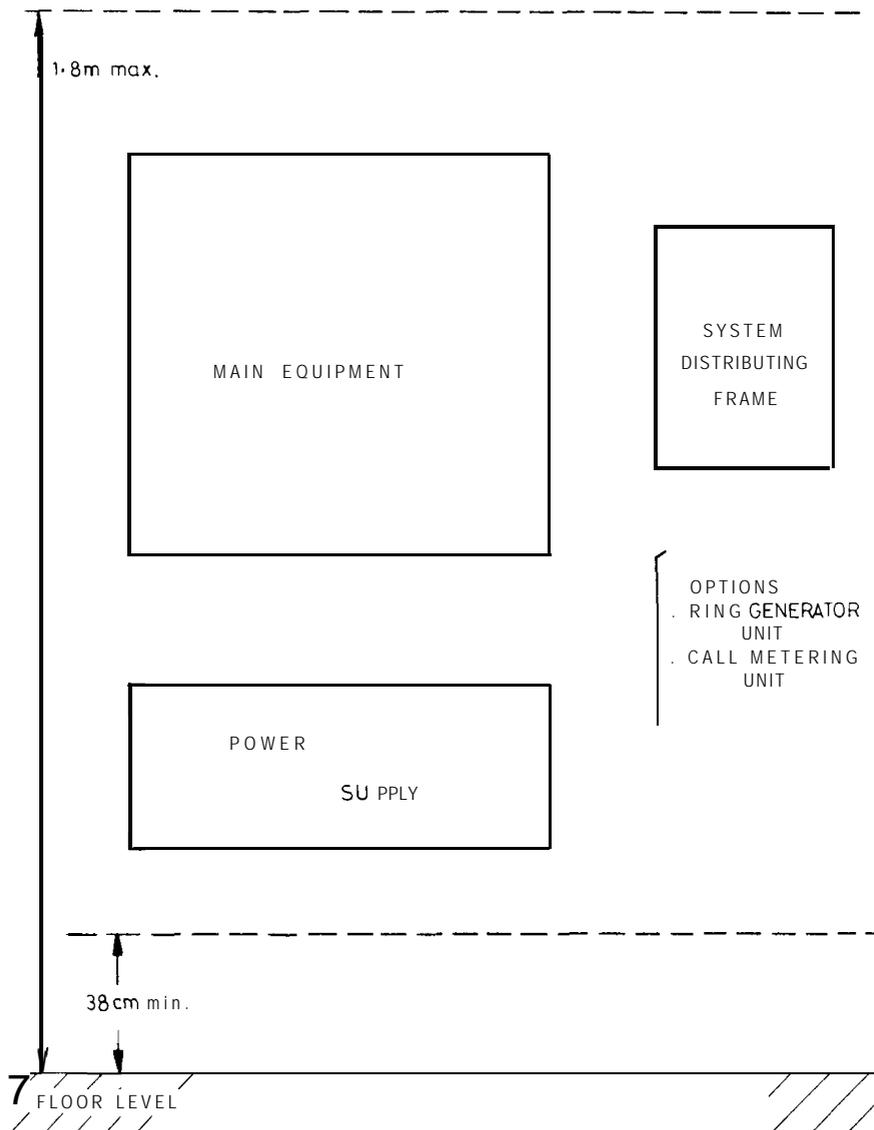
LIMITATIONS ON WALL MOUNTING
